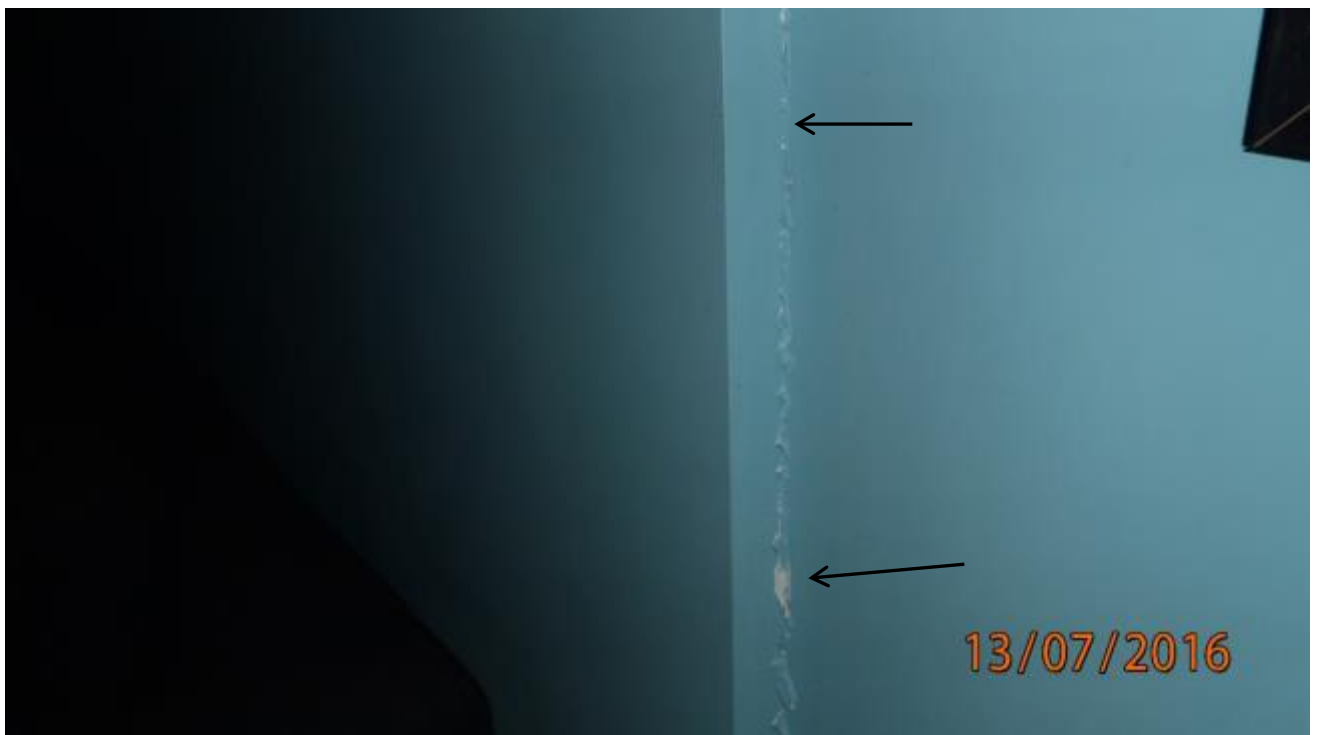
shows separation cracking to the wall cornice junction in the Hallway.
